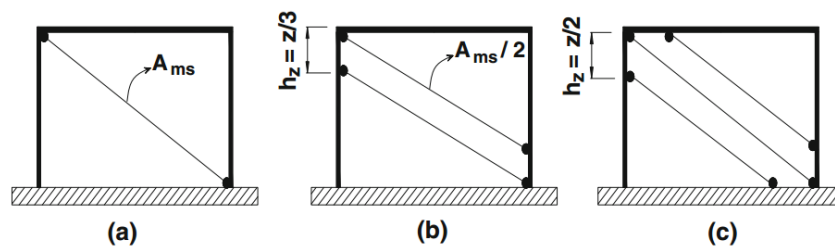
Various strut models (a)Single-strut (b)Double-strut (c) Triple-strut
